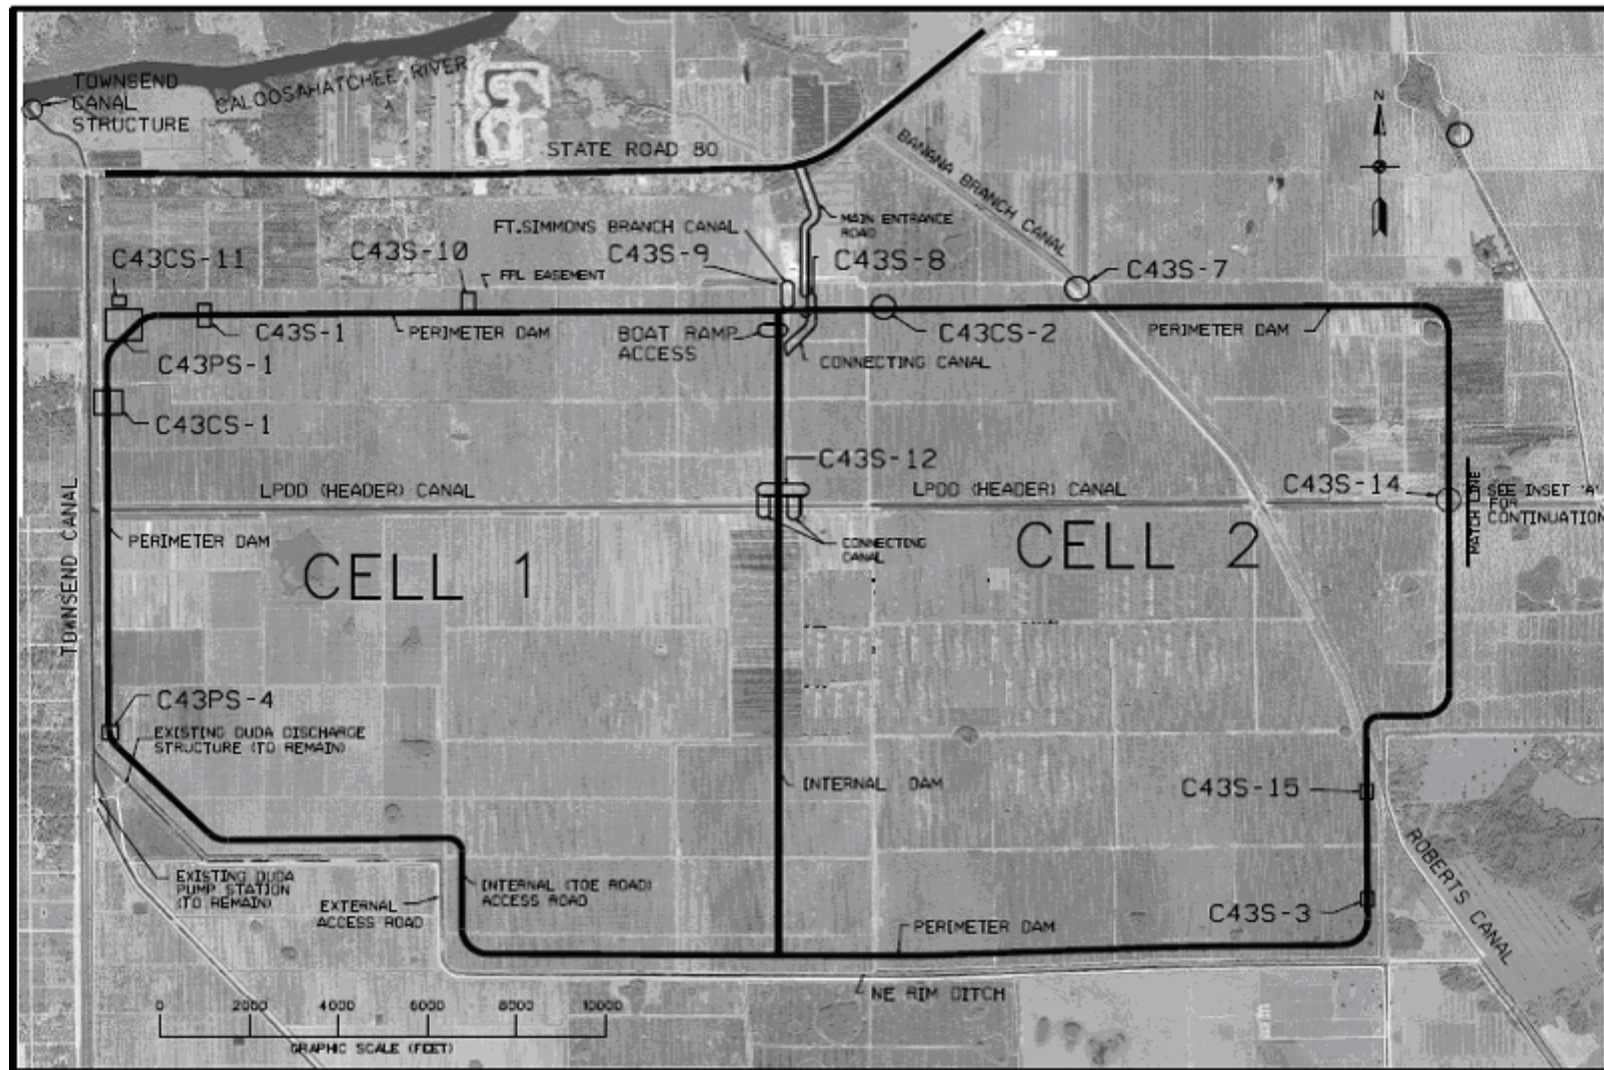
THE SELECTED ALTERNATIVE PLAN
